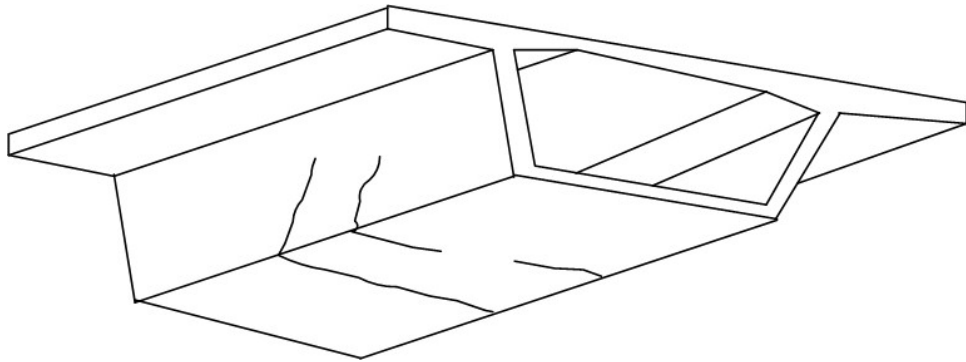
Box Girder Cracks Induced by Flexure-Shear
